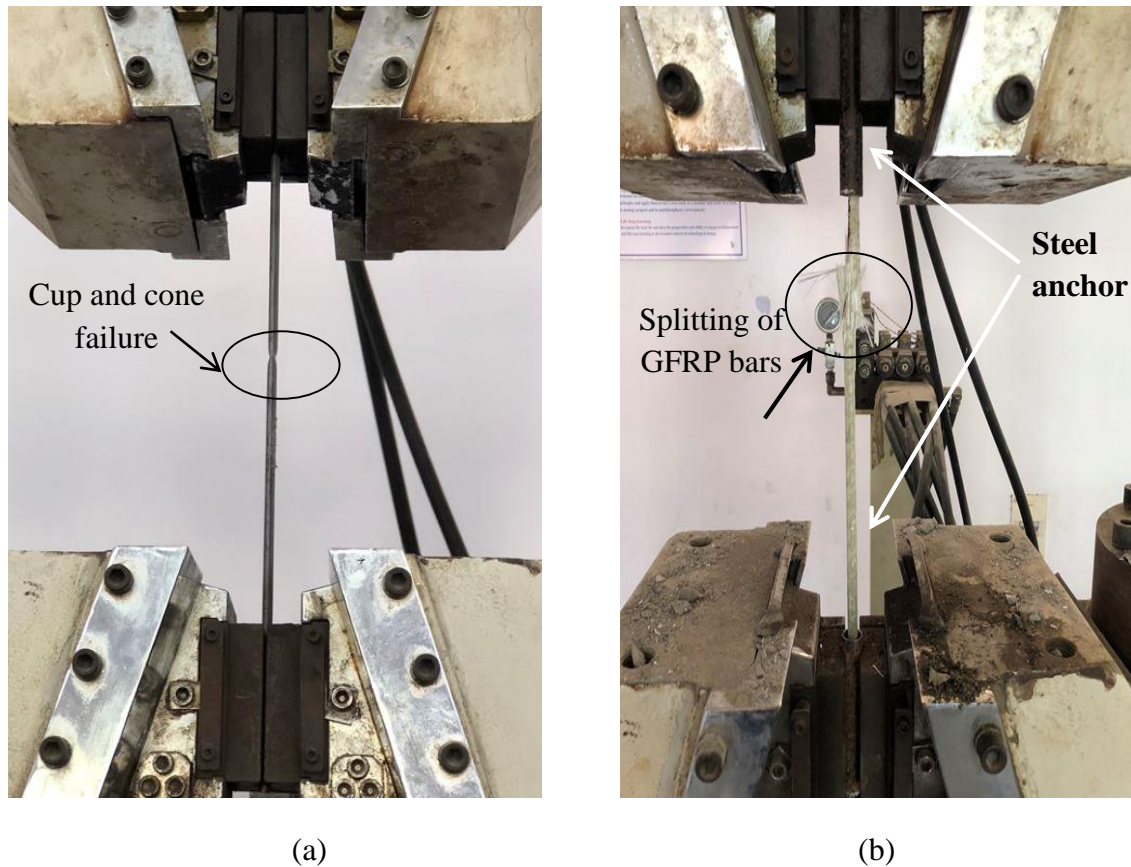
Tensile testing of reinforcing bars (a) Tensile (cup and cone) failure of steel bars and (b) splitting failure of GFRP bars
